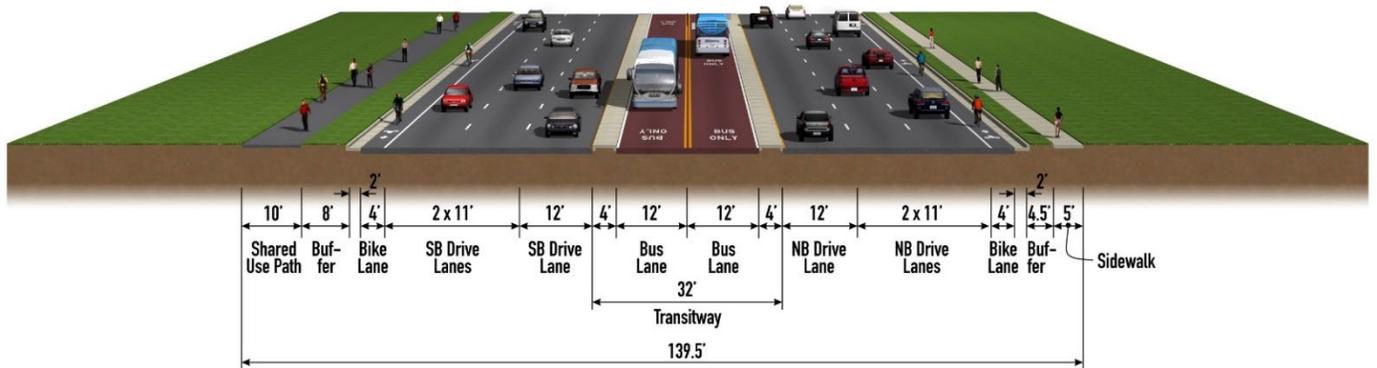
Typical Section – Richmond Highway from Sherwood Hall Lane to Jeff Todd Way
